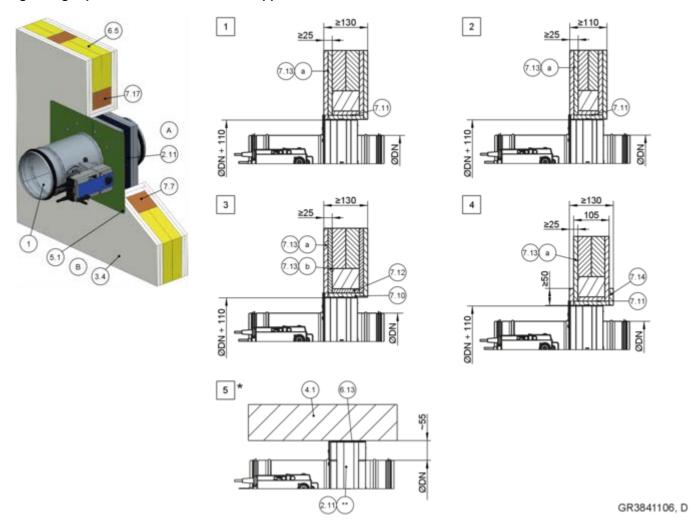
Dry mortarless installation into a lightweight partition wall with timber support structure, with installation kit TQ2
